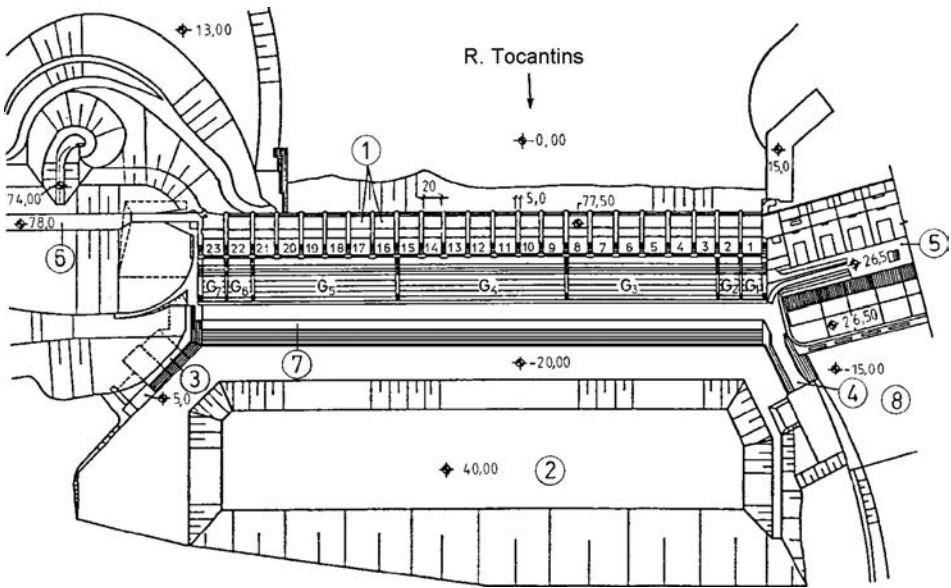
Layout of overflow part of Tucuruí Dam (Rios & Barbalho, 1988). (1) Radial gates; (2) stilling basin, made by excavation into the ground; (3) right lateral wall; (4) left lateral wall; (5) power house of the hydroelectric plant; (6) embankment dam; (7) concrete facing slab; (8) tail race.
